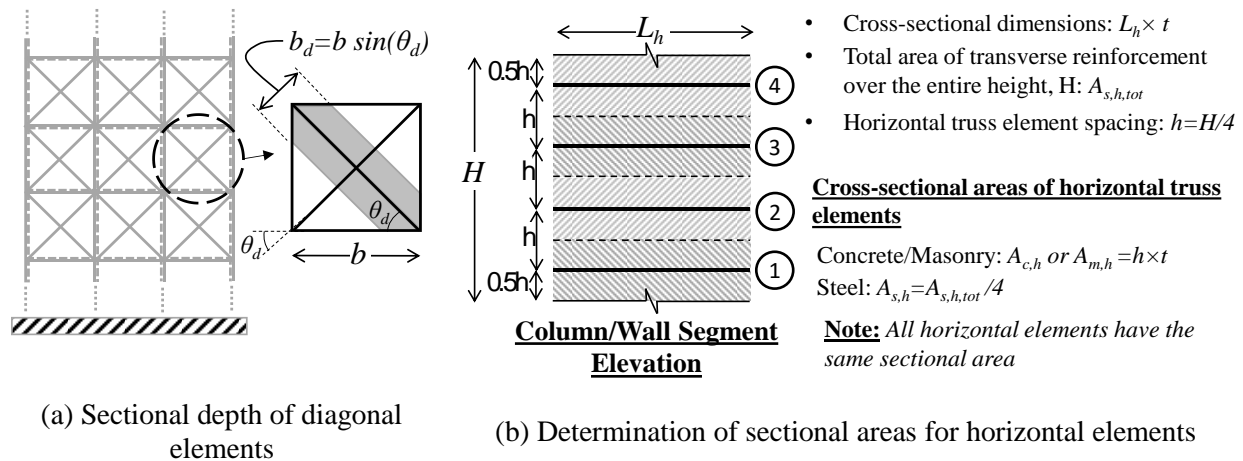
Determination of geometry for diagonal and horizontal truss elements
